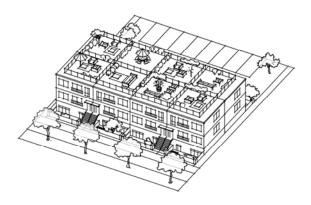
Illustration of courtyard arrangement of stacked townhouses or rowhouses
